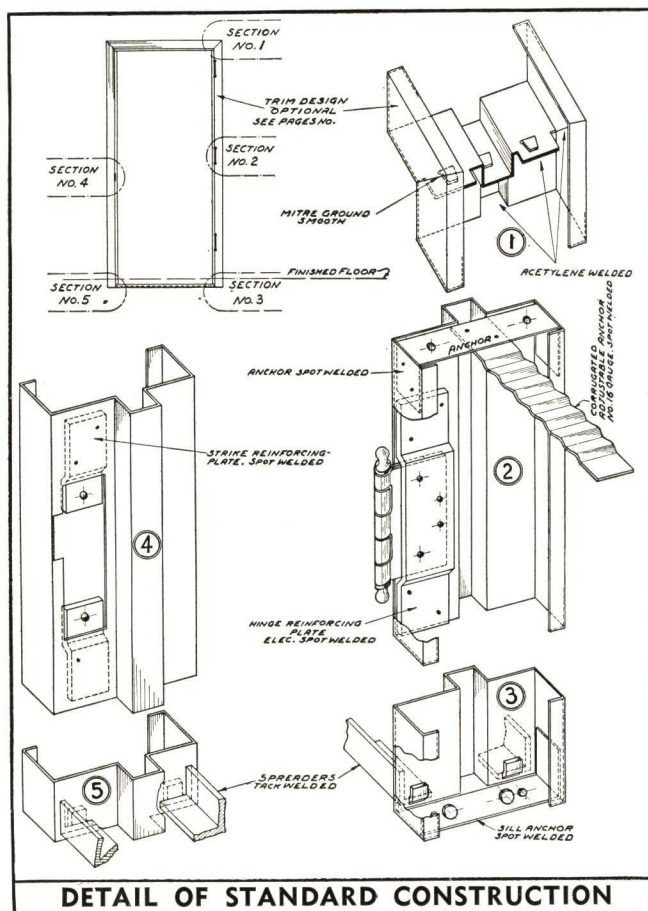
The entire inside through the jamb and mitre is continuously acetylene-welded. This insures that there will be no chance of breaking of head from jamb. Additional rigidity is obtained by the three tongues which prevent the head member breaking away from the jamb.
